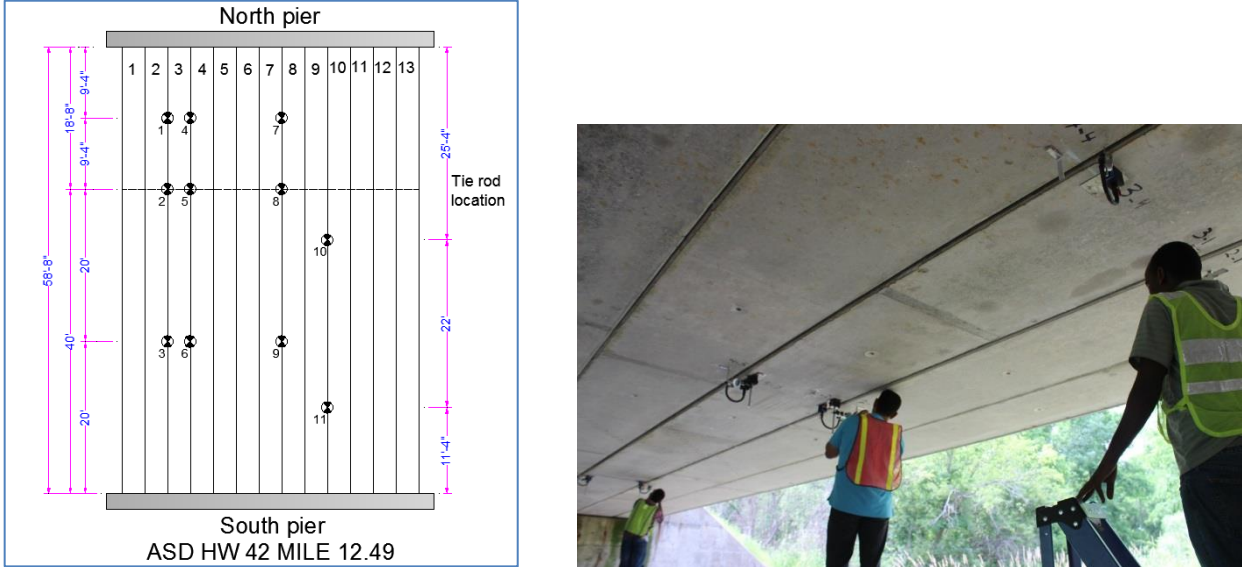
Plan Dimensions and View of the Underside of Bridge ASD-42-12.49
